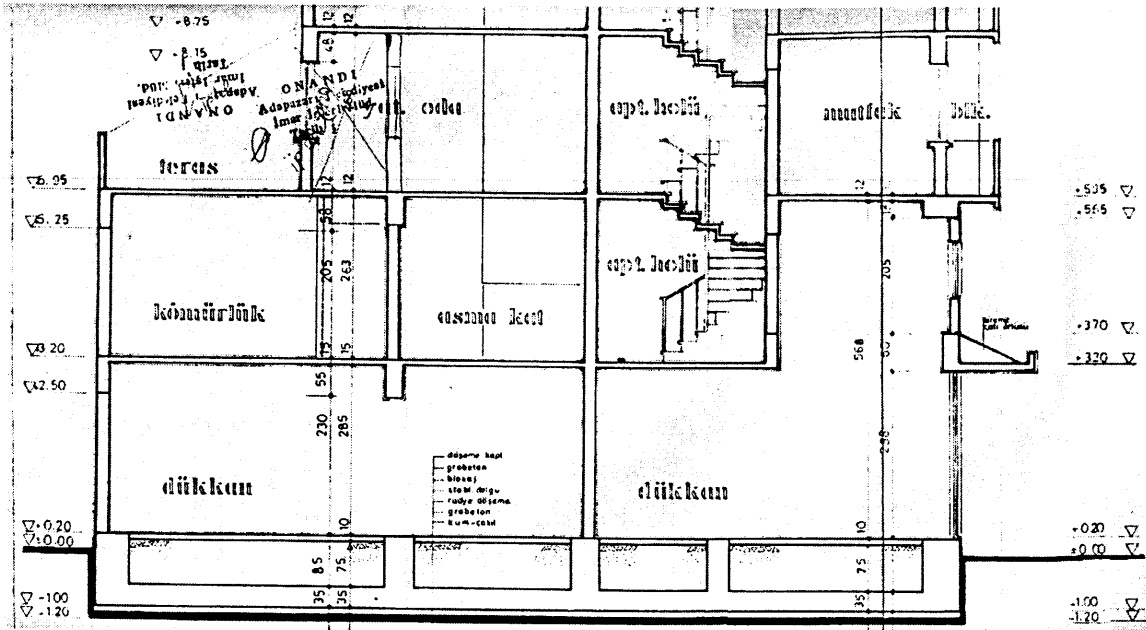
North-south cross section of building I3. Note that the structure changes after the first two stories.
